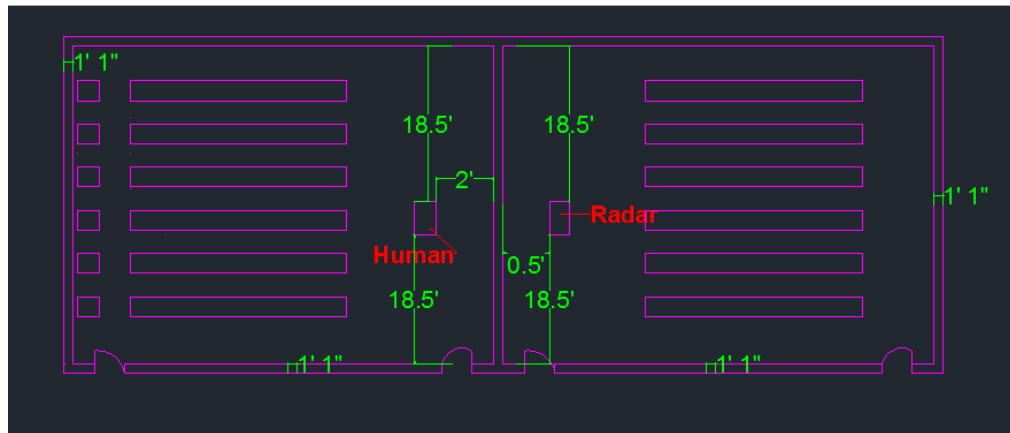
Location of Radar and Human Target, Partition wall – Gypsum Wall.
